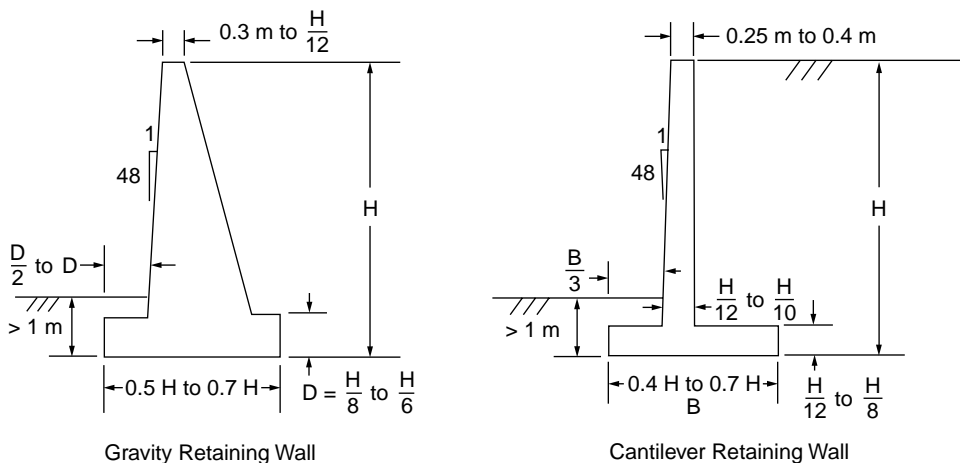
Tentative gravity and cantilever wall dimensions.
